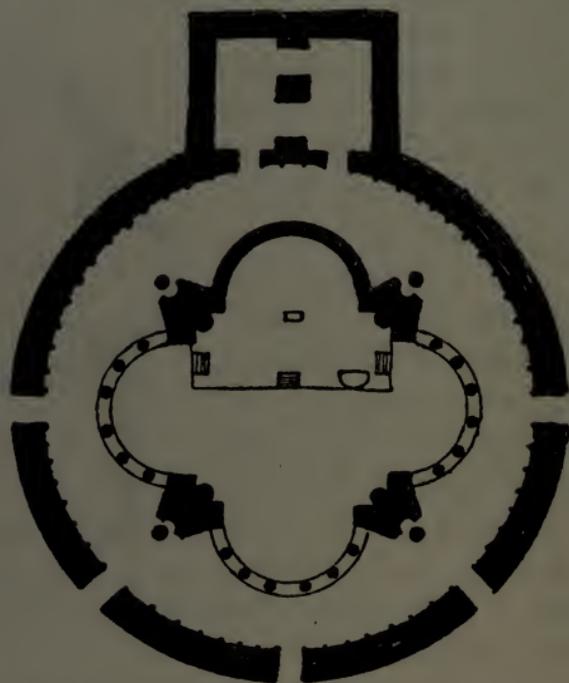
Plan of the church of St. Gregory, Etschmiadsin, Armenia, *c.* 650.
